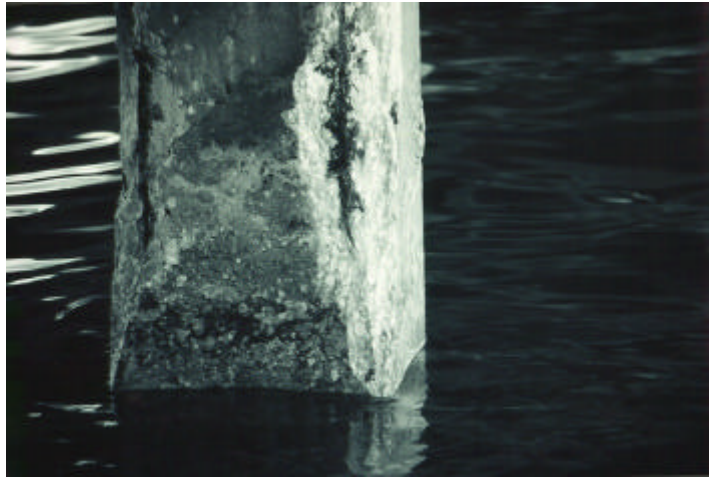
Exposed Steel in a Deteriorated Prestressed Concrete Pile
